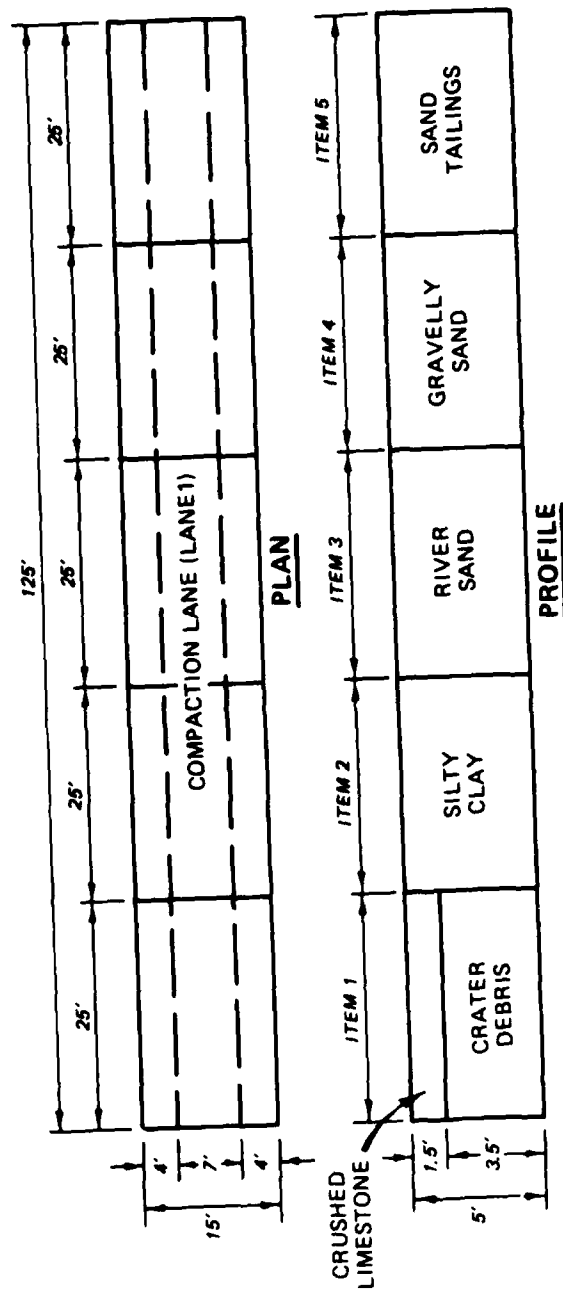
Plan and profile, Test Section No. 1, vibratory roller
